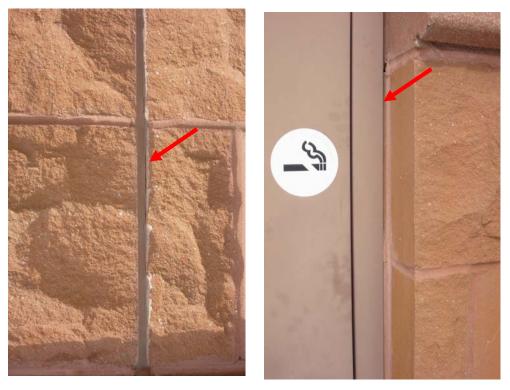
South façade cast stone building base – expansion joint sealant failure.
